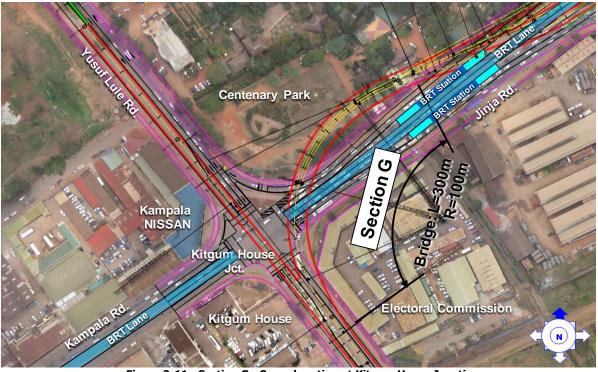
Section G : Curved section at Kitgum House Junction Source: JICA Progress Report 2
